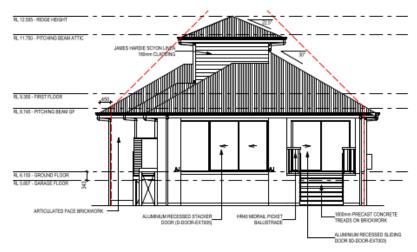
West Elevation (Rear). Source: McDonald Jones.
